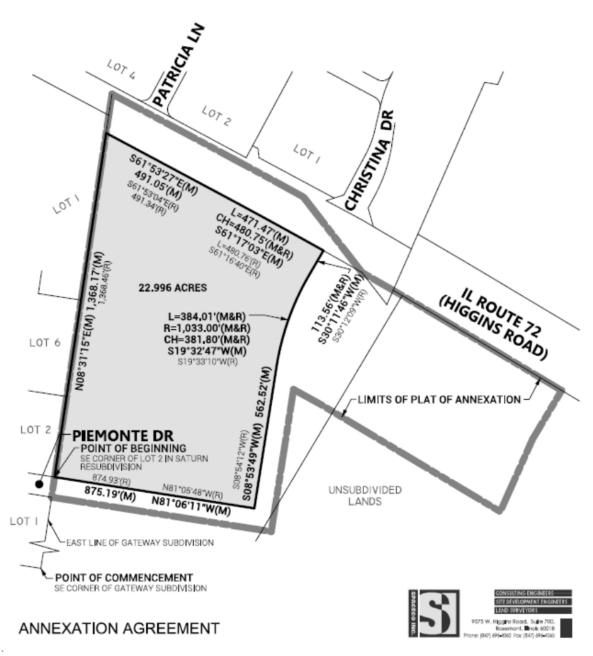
SITE PLAN OF THE PROJECT
